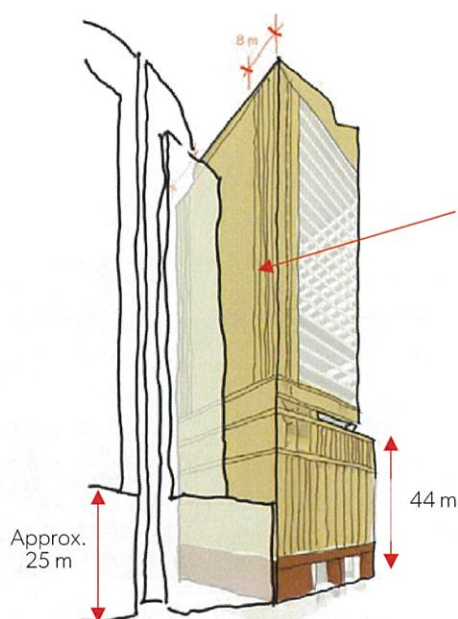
| Sketch of corner treatment of tower showing south elevation panelling (Source: Design Review Panel material)
